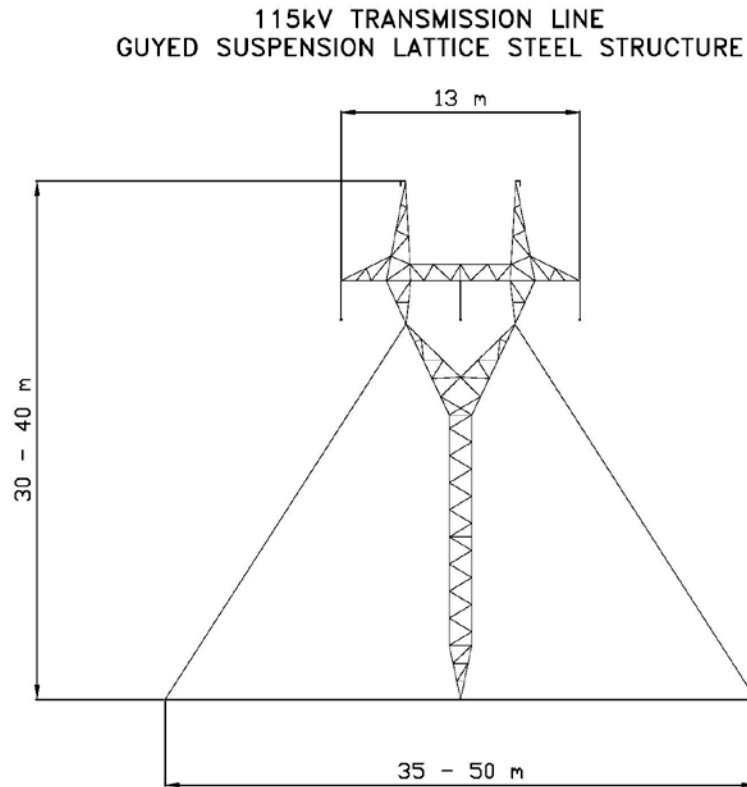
Guyed Lattice Steel Structure – Preliminary Design
